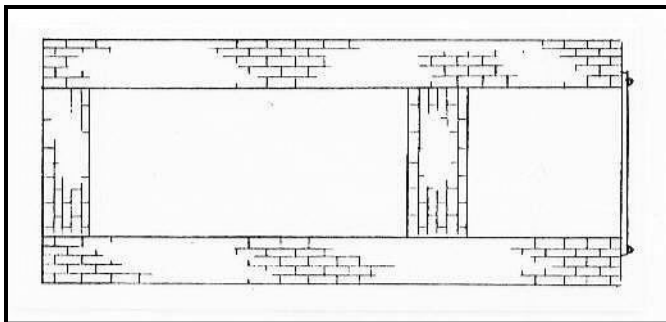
Few return-tube boilers currently remain intact and have been reduced to setting remnants and foundations, such as the one in the plan view. Source: Twitty, 2002:145.
